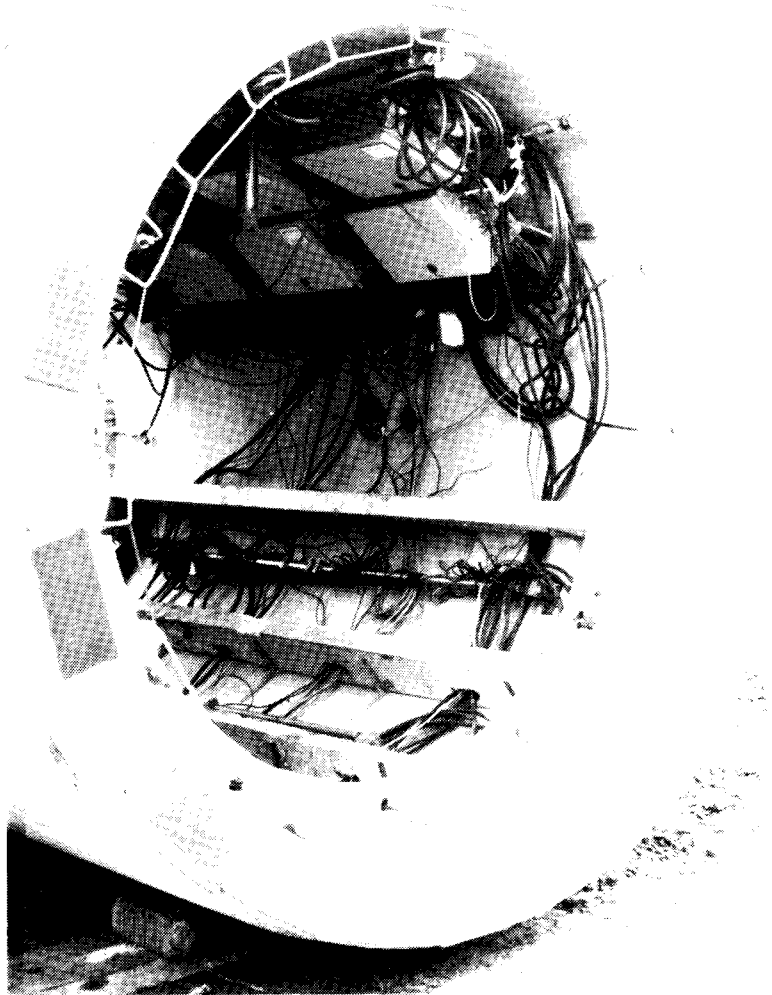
Instrumented pipe ready for lowering into the jacking pit.
